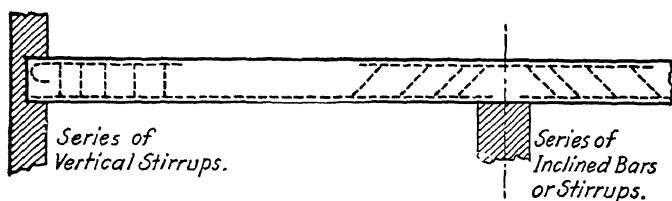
Typical Reinforced Concrete Beam without Special Anchorage; Web Reinforced by Means of Series of Vertical Stirrups; or Series of Inclined Bars or Stirrups.
